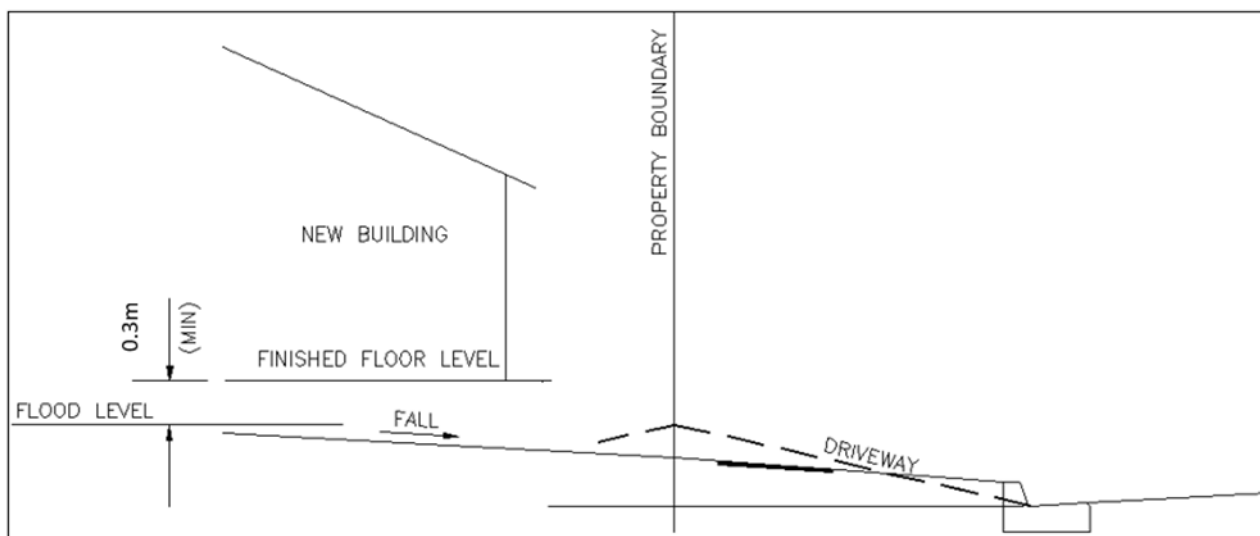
Properties that slope away from the road by a grade of more than 0.25%
